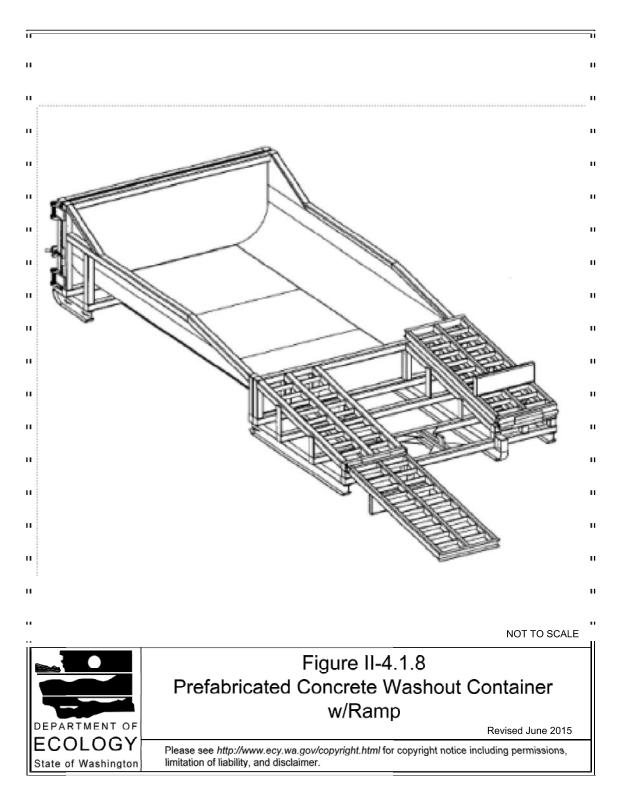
Prefabricated Concrete Washout Container w/Ramp
